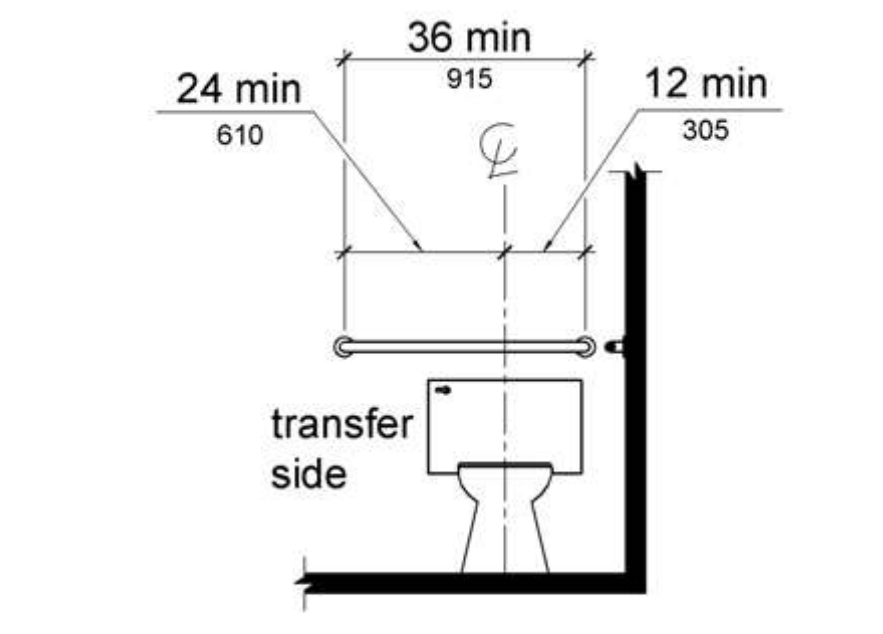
Rear Wall Grab Bar at Water Closets
